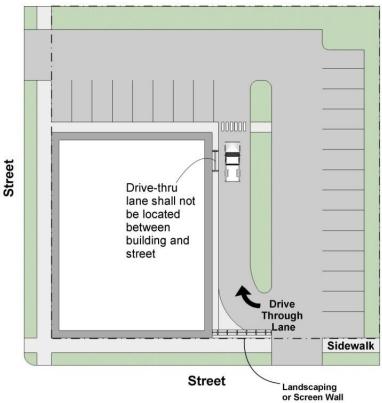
Urban Context – Landscaping or Screen Wall and Drive-Through Location
